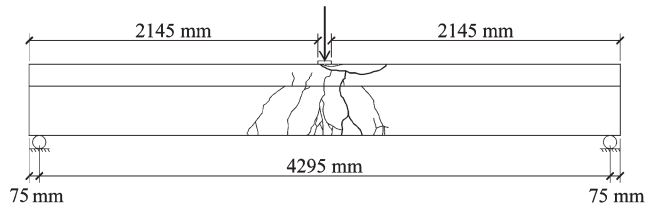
Test setup and crack patterns for multiple-strand development length specimen HPC-2 (north face).
